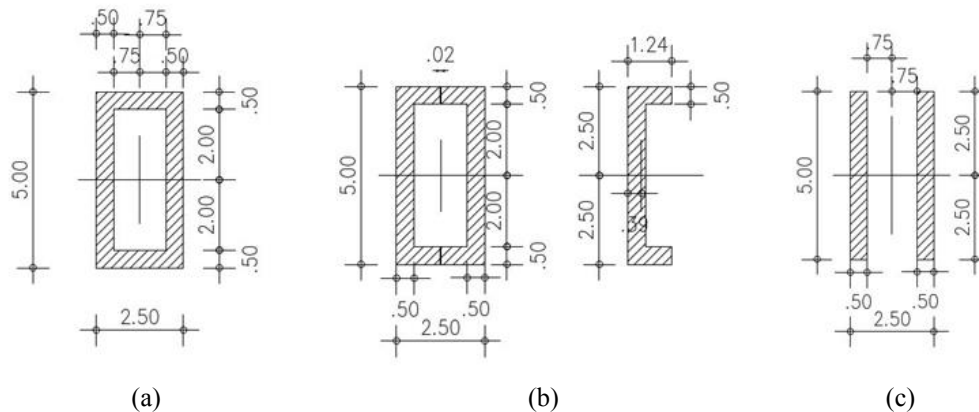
Sections of piers: (a) tall piers, (b), (c) short piers.
